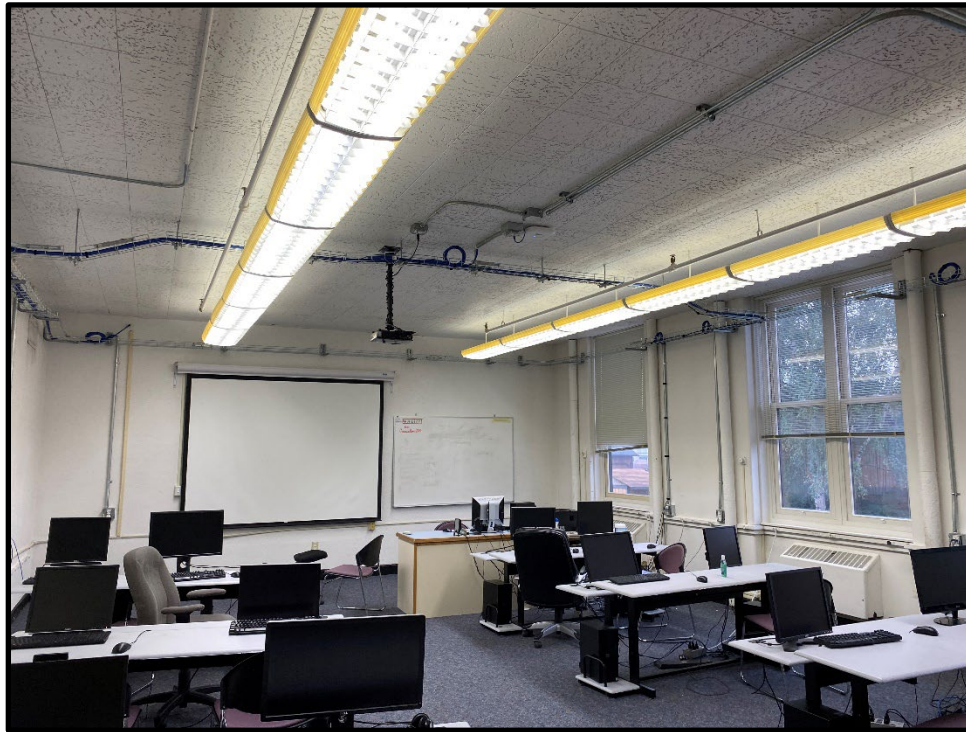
Classroom 1 has two layers of carpet over ACM flooring tiles
